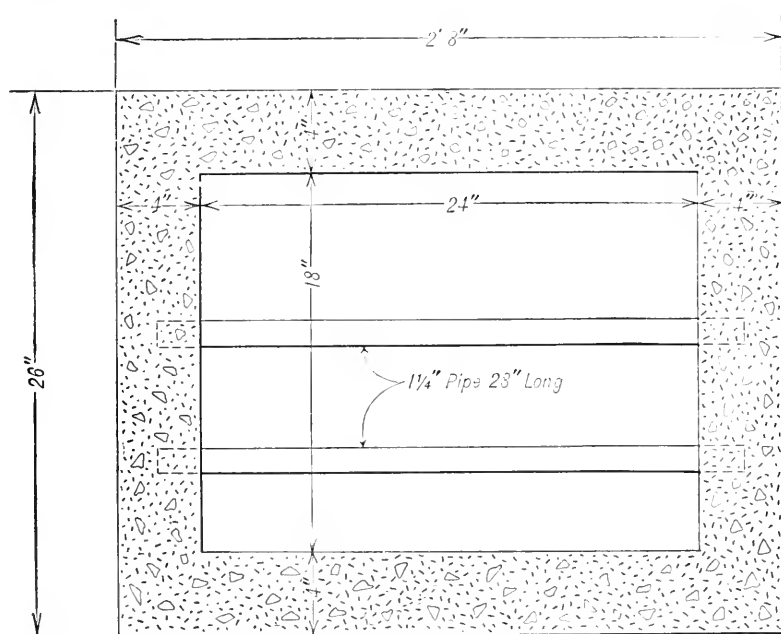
BOX-TYPE CONCRETE CONDUIT.
